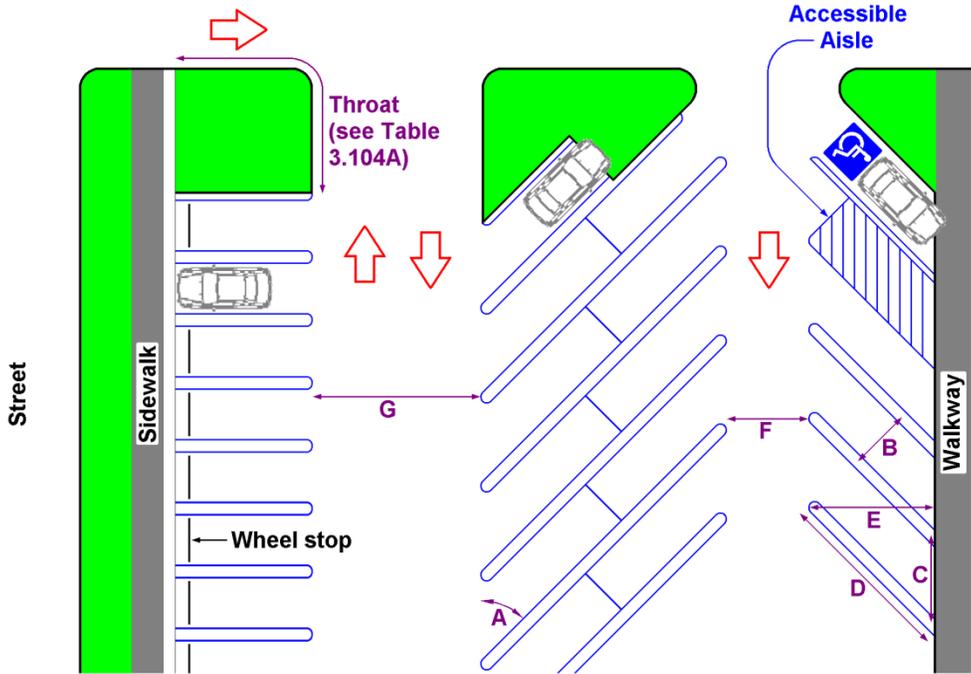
B Illustration of Parking Space and Aisle Dimensions
